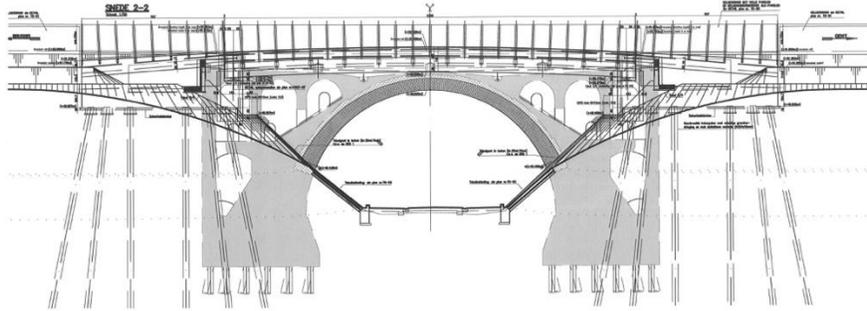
Masonry arch bridges at the Kouterstraat and Bullenbergstraat.
